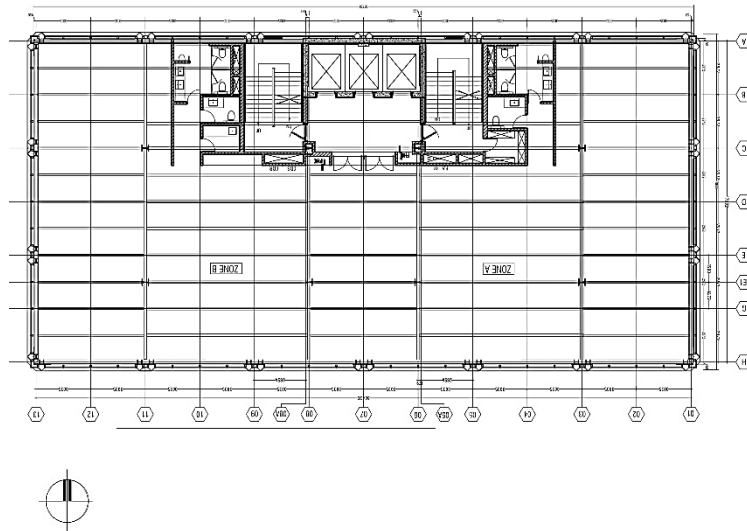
11th floor plan of Glass house (Source: EHSAN KHAN ARCHITECTS LTD)
